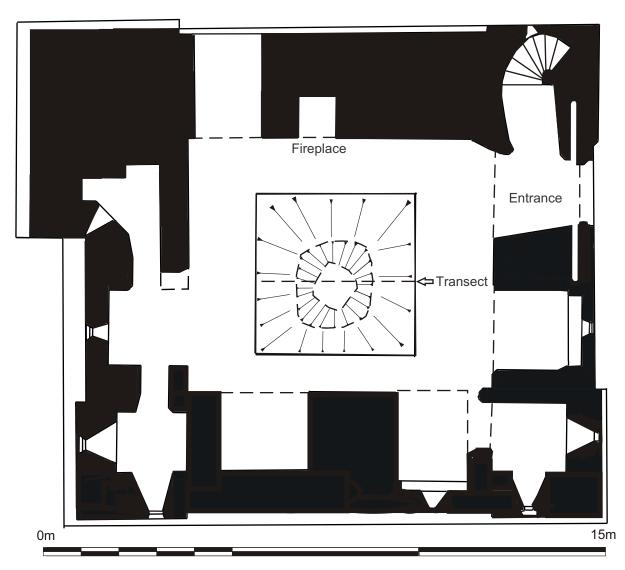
Plan of castle, after Salter (1988), showing trench location
